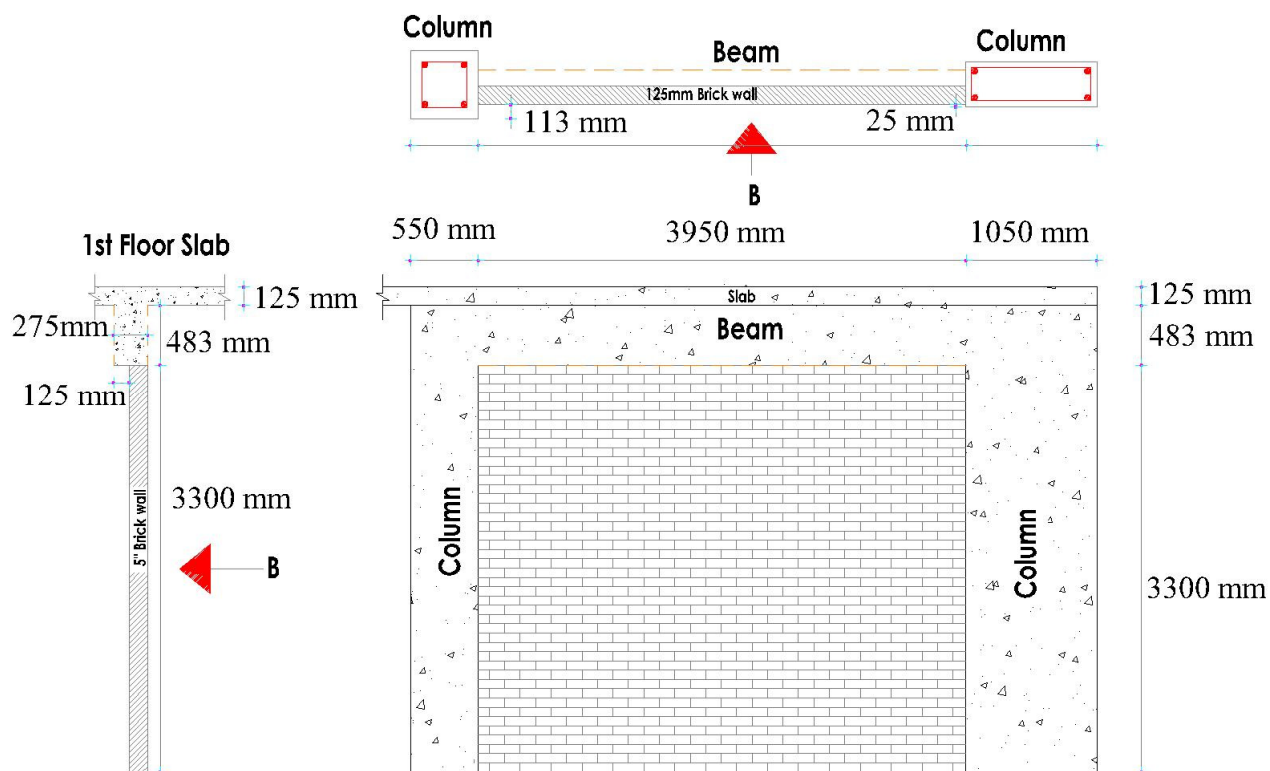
Plan, Section and elevation of the target infill wall (All dimensions are included plaster thickness)
